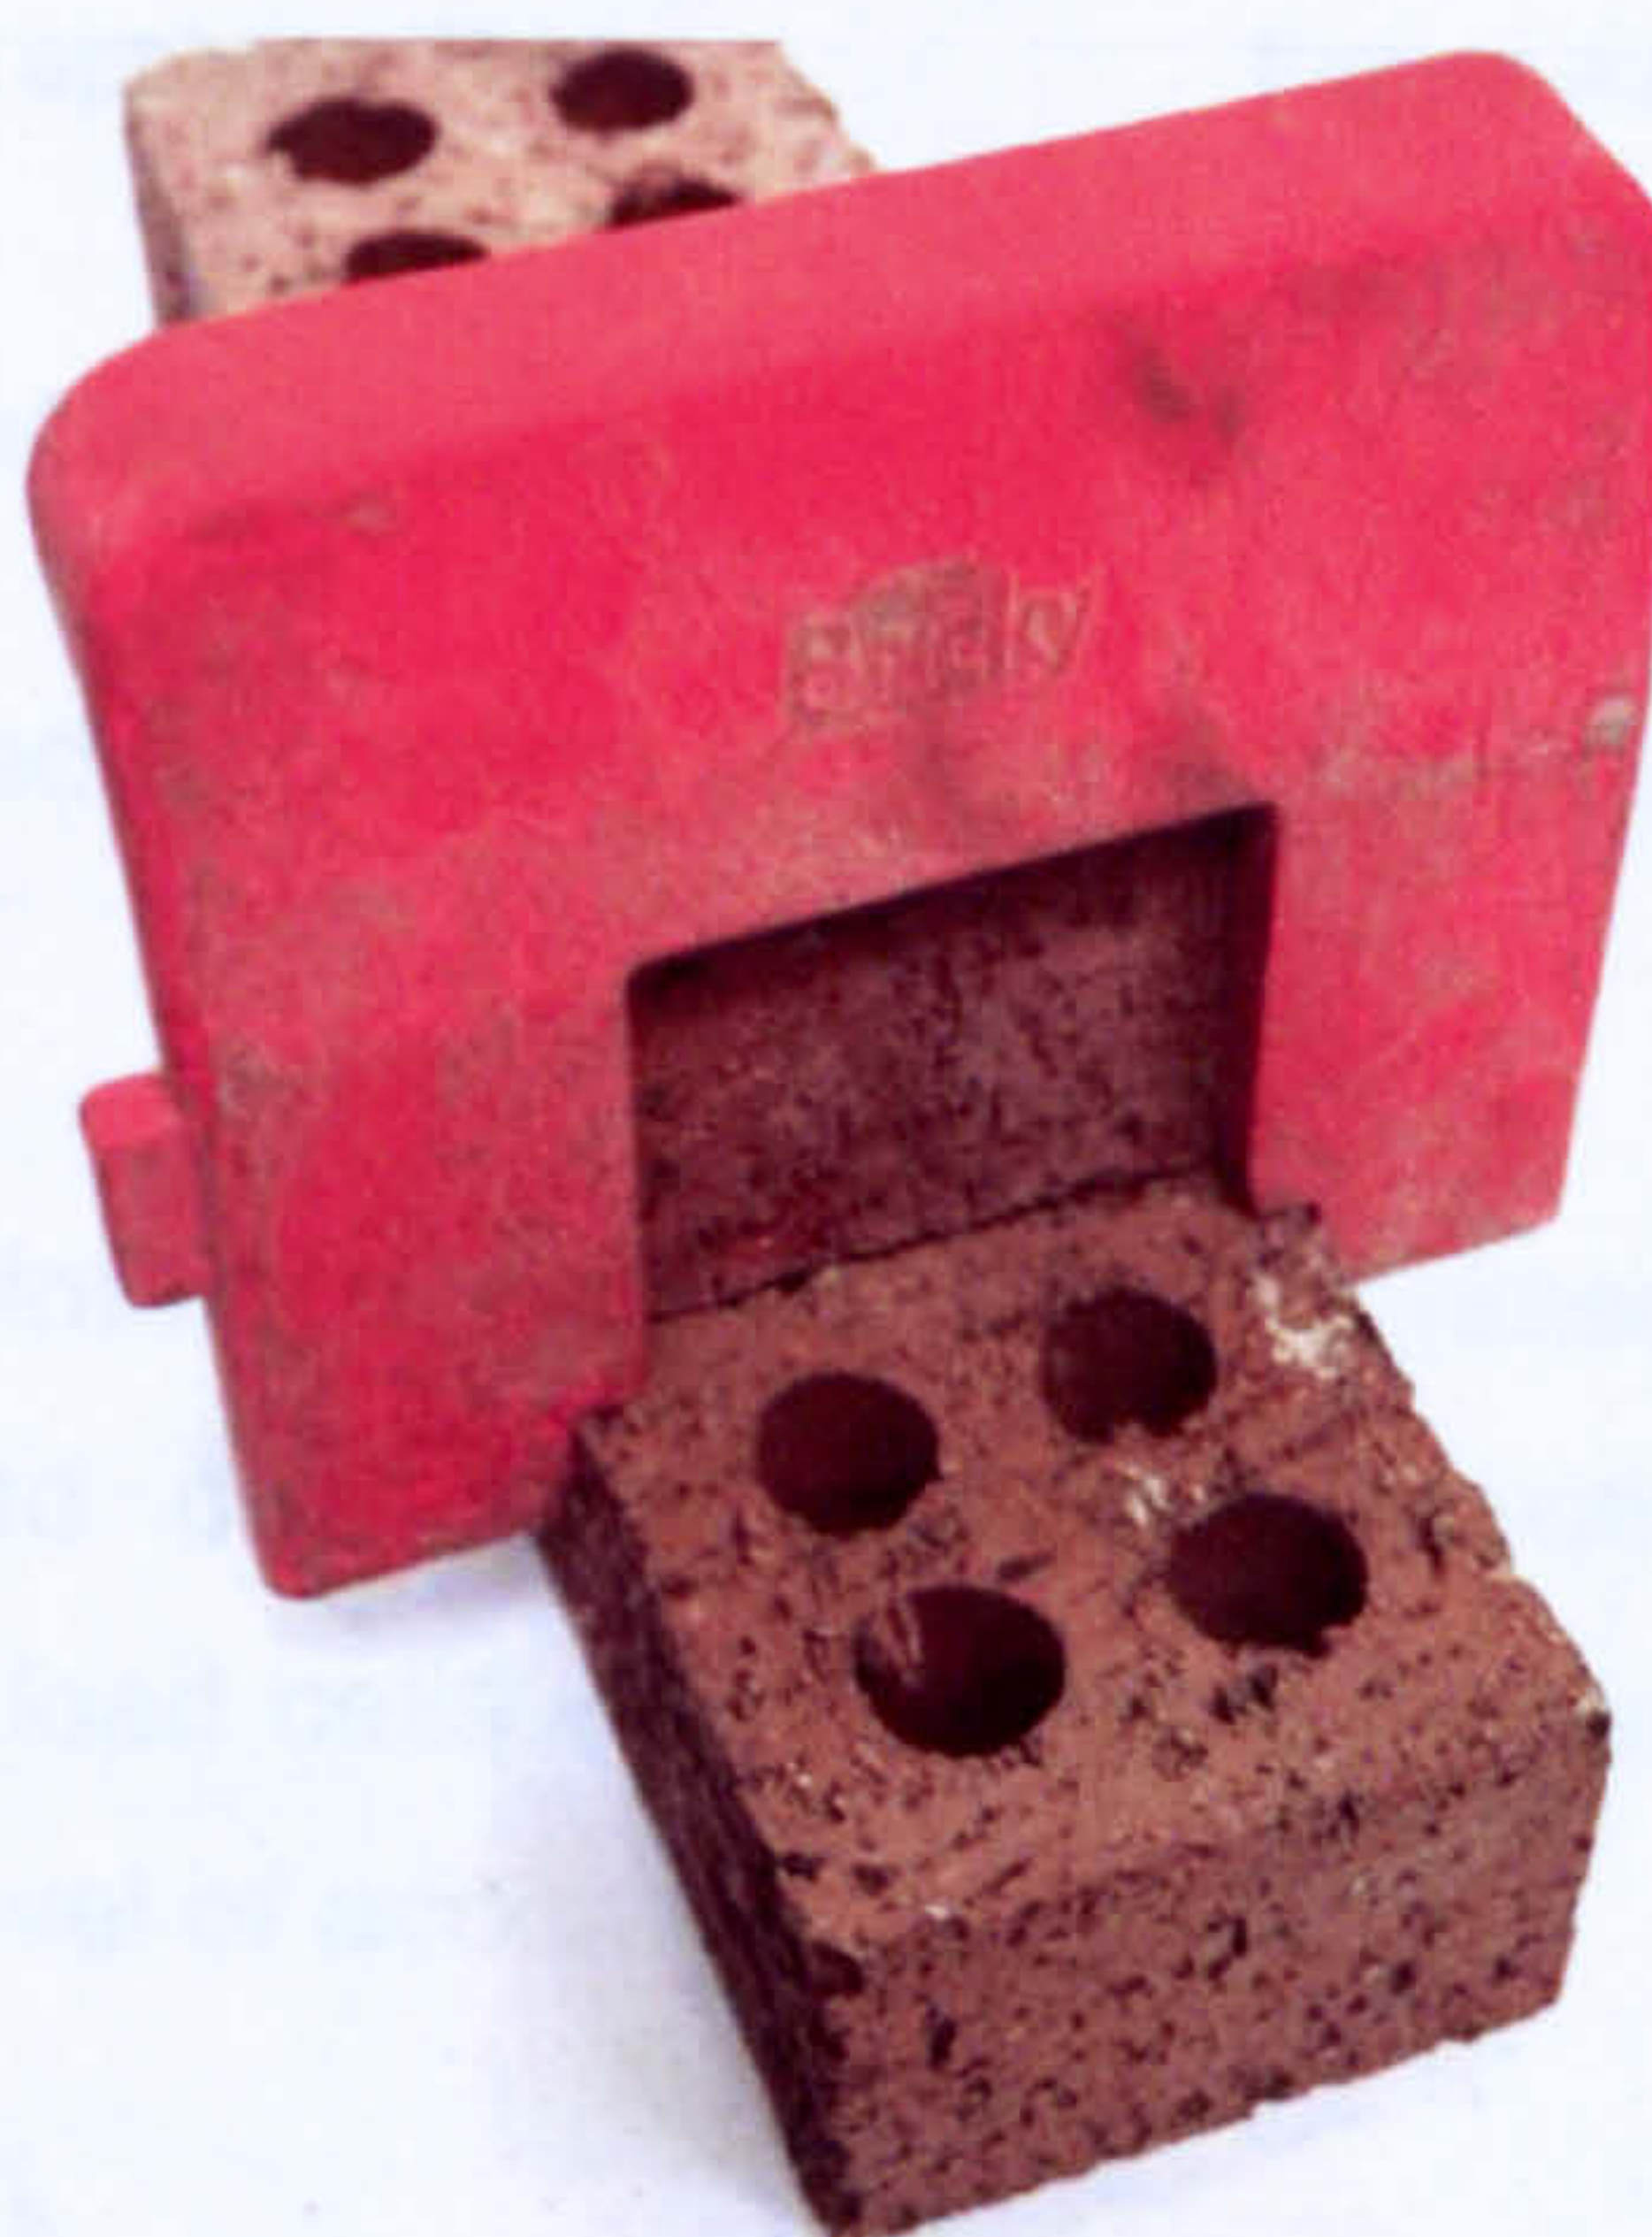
“Bricky” tool in place for mortaring the perpend joint
